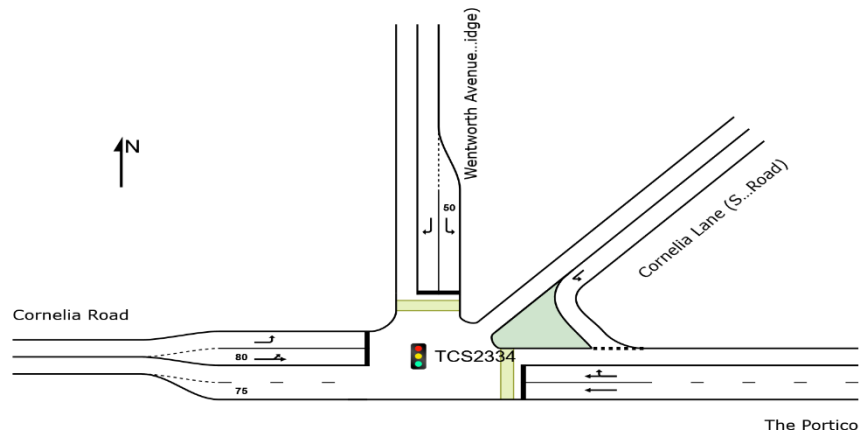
Project Case layout of Wentworth Avenue / Cornelia Road / The Portico.
